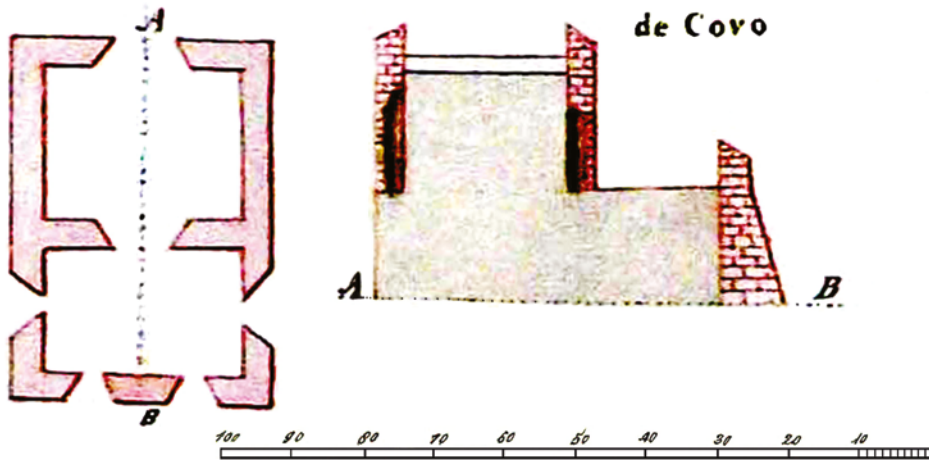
Forte de Passo do Covo (Fort of the Low Pass), Plan and Section A-B. The section shows that the level of the yard and the chamber were well above ground level, but no ramp is shown to indicate how one could reach to the floor level of the fort. The plan indicates that if there were a ramp it would have been at the point indicated by the letter A. In this case the entrance opened to the roofed chamber first and then through the chamber to the yard – an unusual arrangement.
